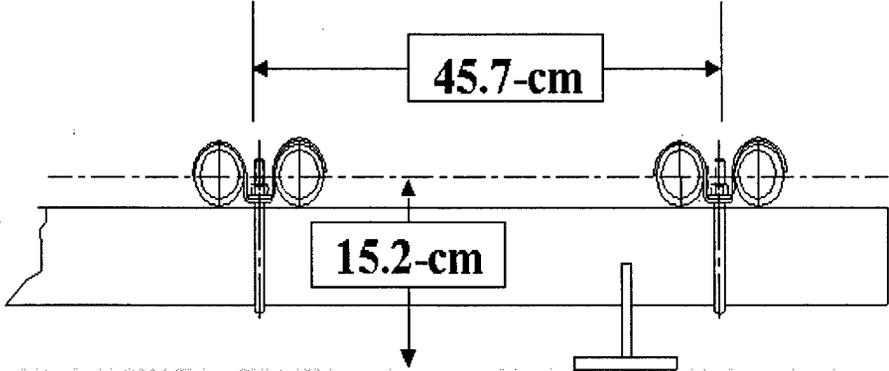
Sketch Showing Cooling Coil Spacing and Standoff Distance from the Tank Floor
